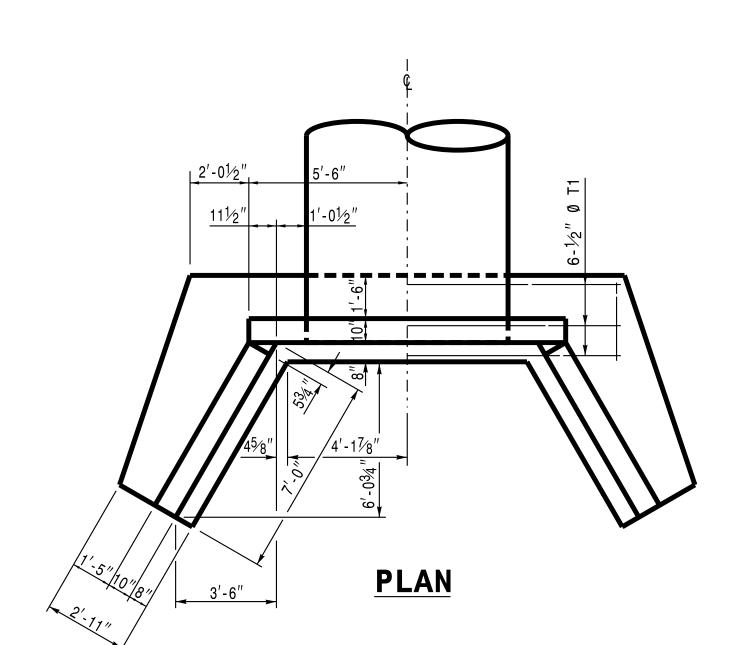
DETAIL OF REINFORCED CONCRETE ENDWALL FOR 84" DIAMETER PIPE - 90° SKEW
